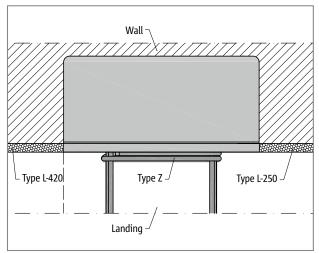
Schöck Tronsole® type Z: Element configuration, Detail A
